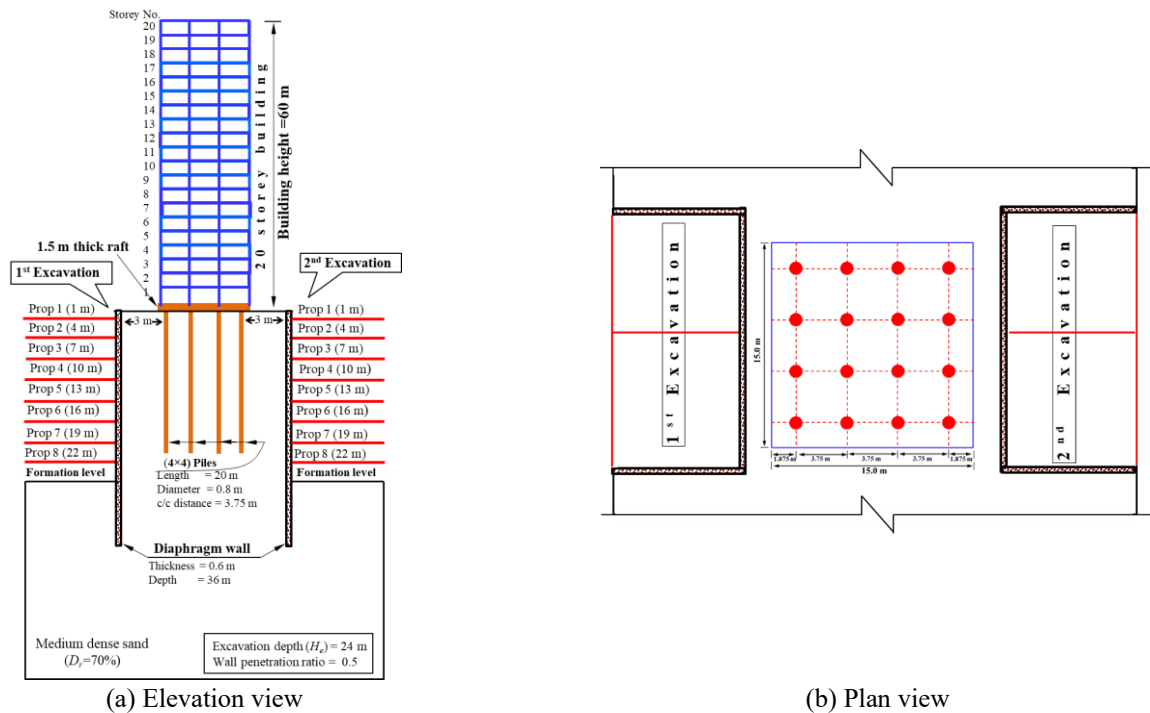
General setup of the high-rise building and a basement (a) Elevation view and (b) plan view
